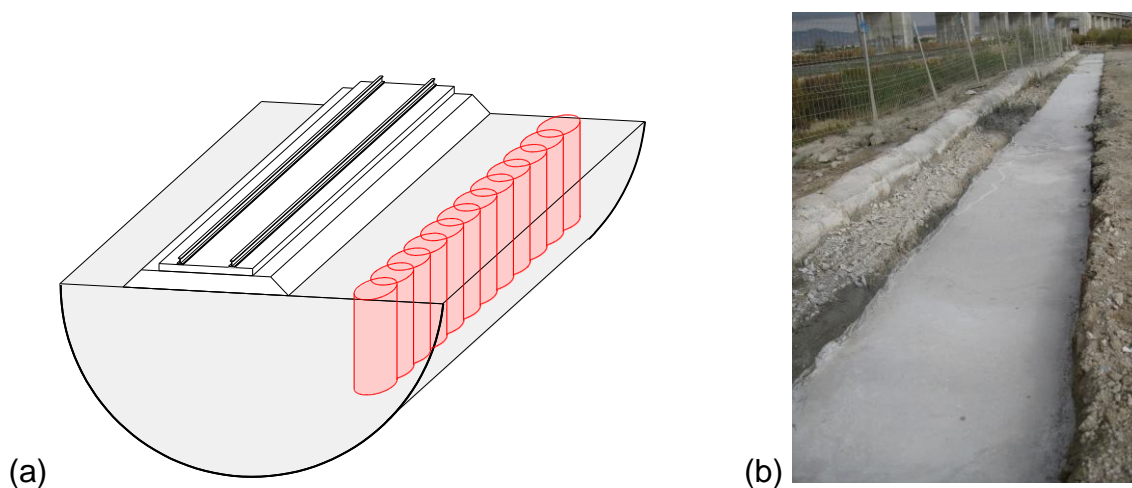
(a) Sketch of the stiff wave barrier consisting of overlapping jet grout columns and (b) the stiff wave barrier after construction at the site of El Realengo.
